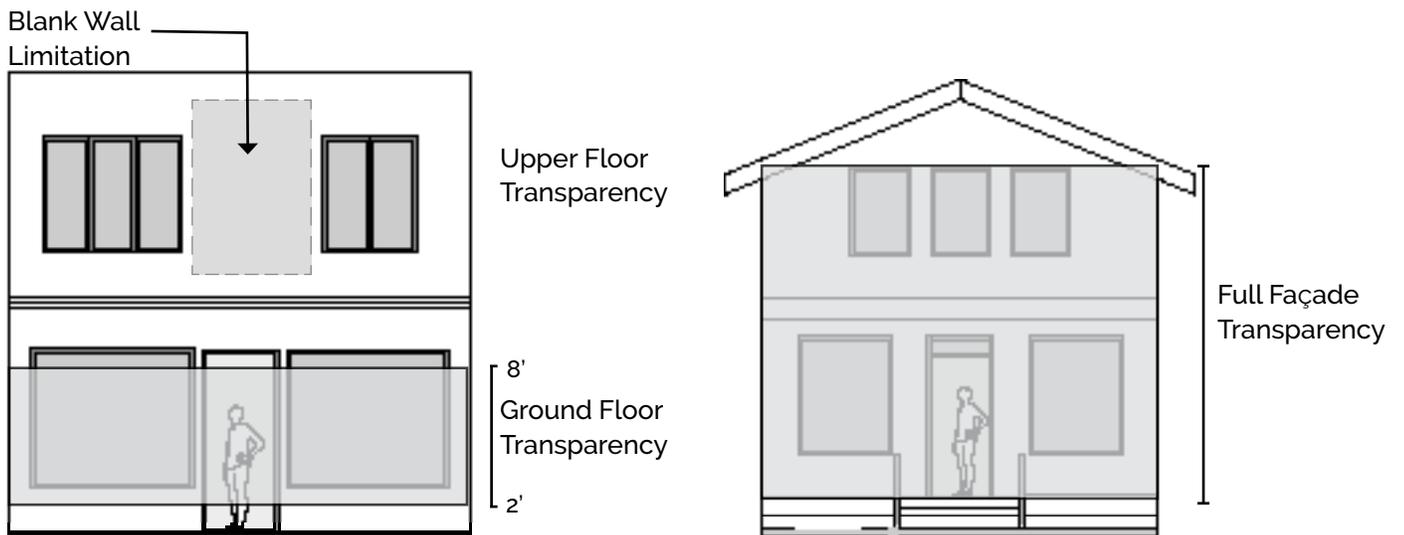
Measuring Transparency: Ground Floor, Upper Floor, & Full Façade
